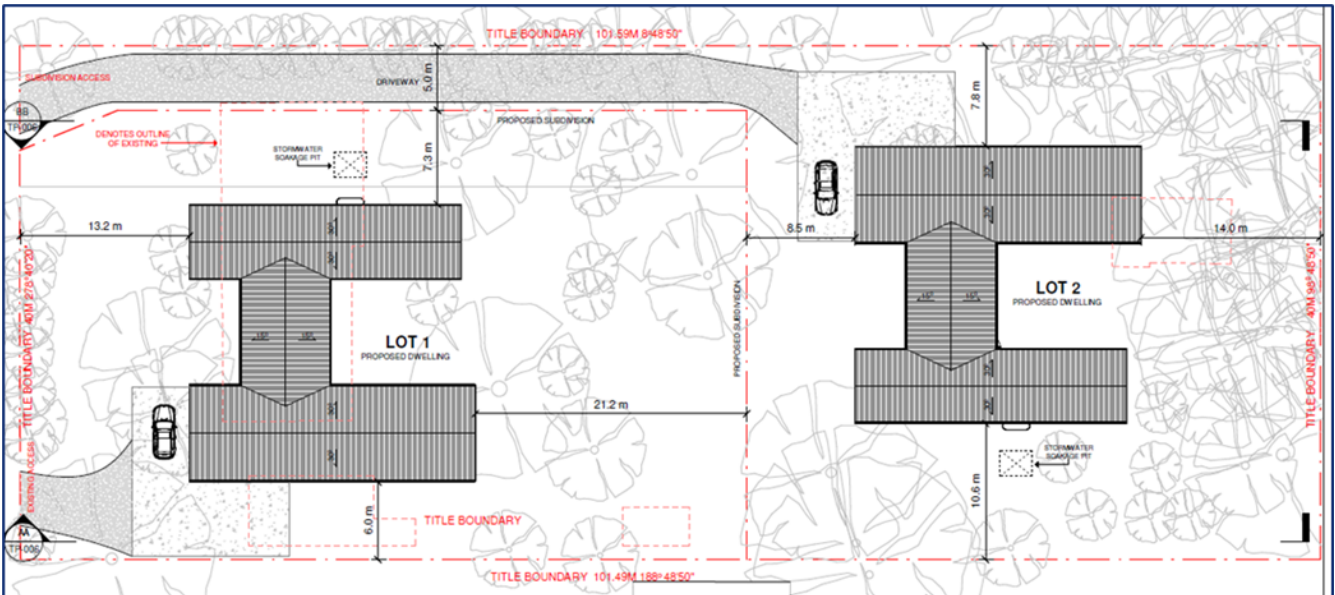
Proposed Site Layout Plan, showing dwellings and Plan of Subdivision
